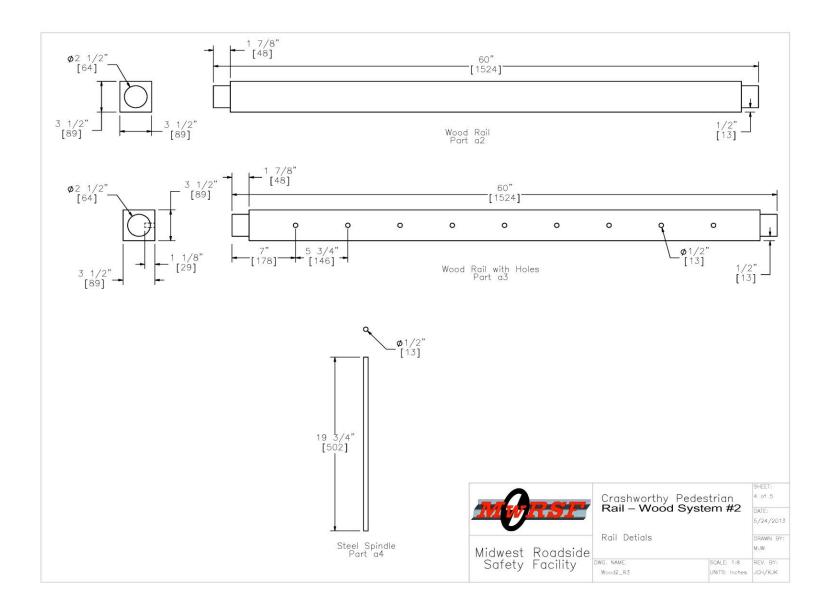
Cutout Wood Rail, Design Concept WOOD2 (Sheet 4 of 5)
